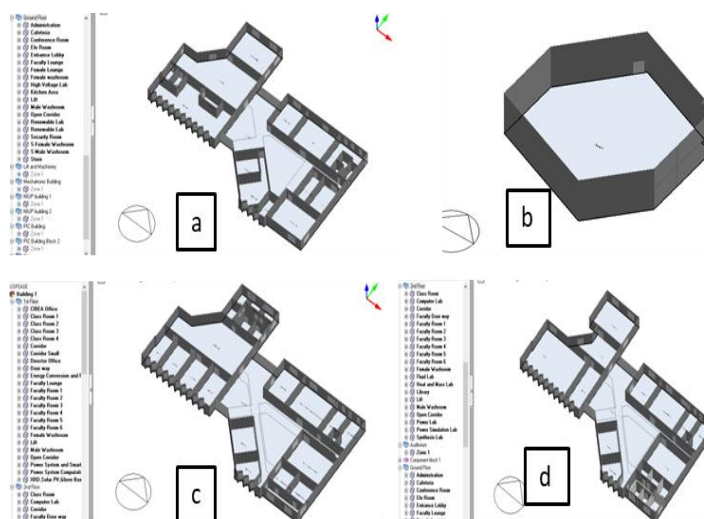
(a & b) Internal zones of case study building showing Ground floor; (c) First floor; (d) Second floor.
